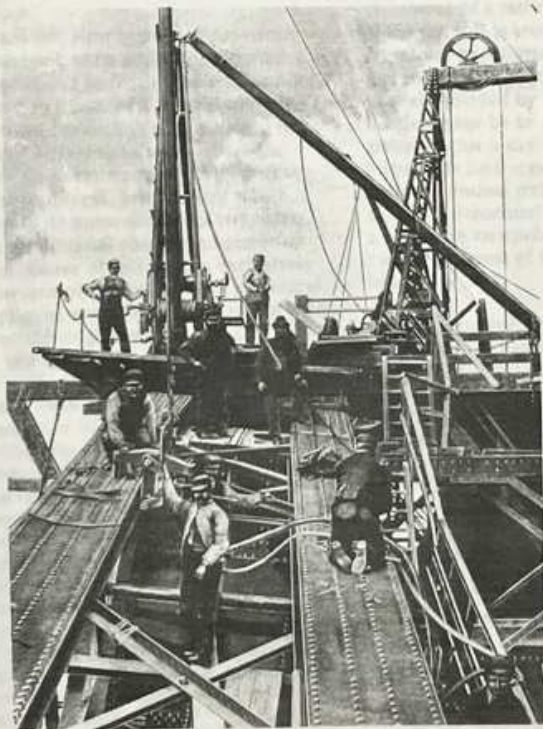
Forth Bridge — rivetting Queensferry south-west top member in June 1888. *The Engineer* 9 November 1888
